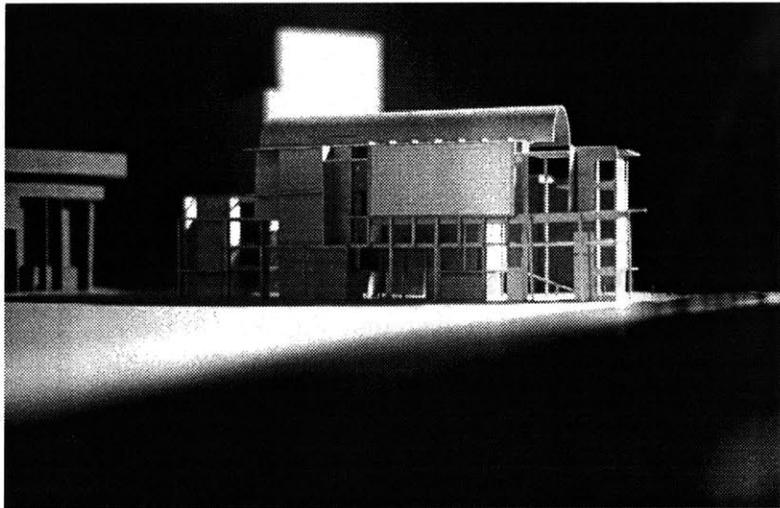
Model, north elevation facing plaza, shown with electric billboard and pedestrian arcade.
